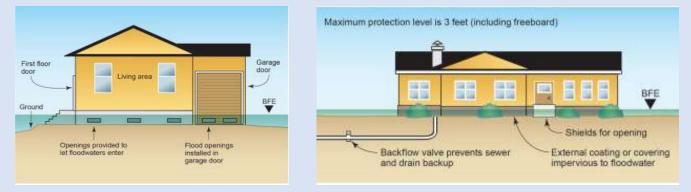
and 4b: Schematic example of wet floodproofing (4a, left) and dry floodproofing (4b, right).
